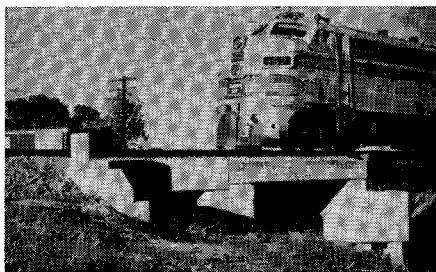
C.B.&Q. RR Bridge 38.64 at Hunnewell, Missouri.
